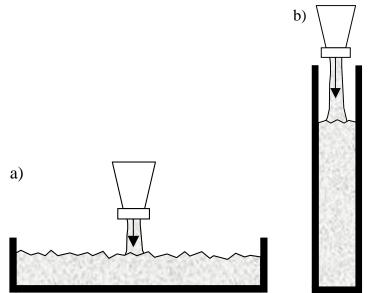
Specimens cast in the correct position; a) wall or ceiling; b) wall
